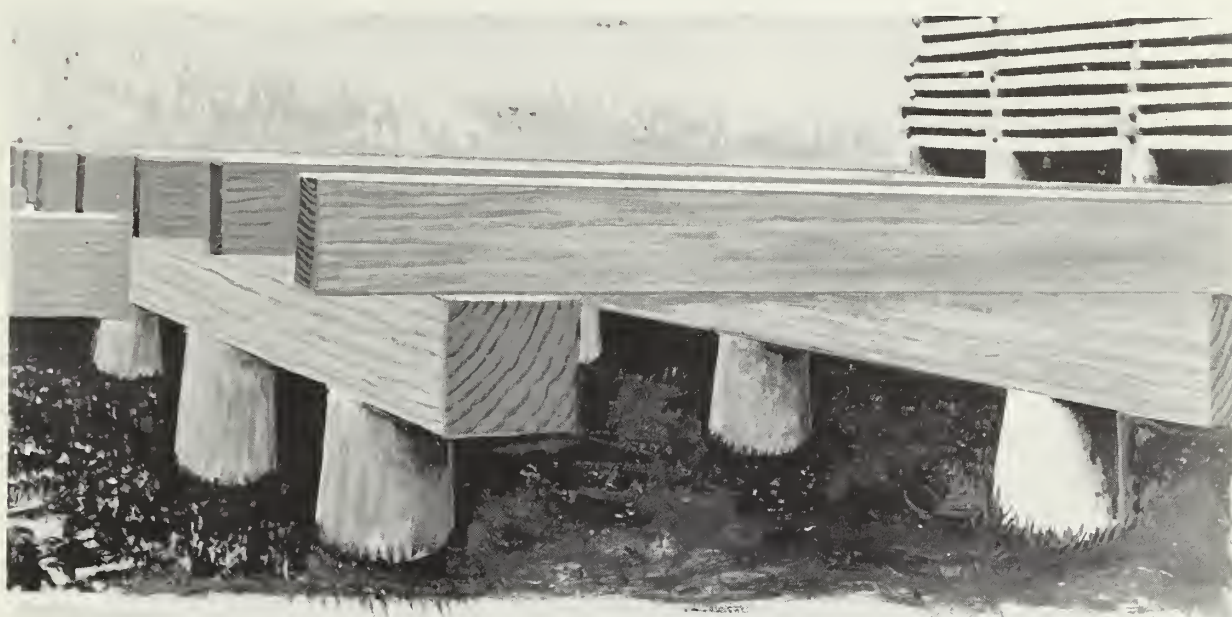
A good pile foundation consisting of posts, stringers, and crossbeams, with slope from front to rear.
